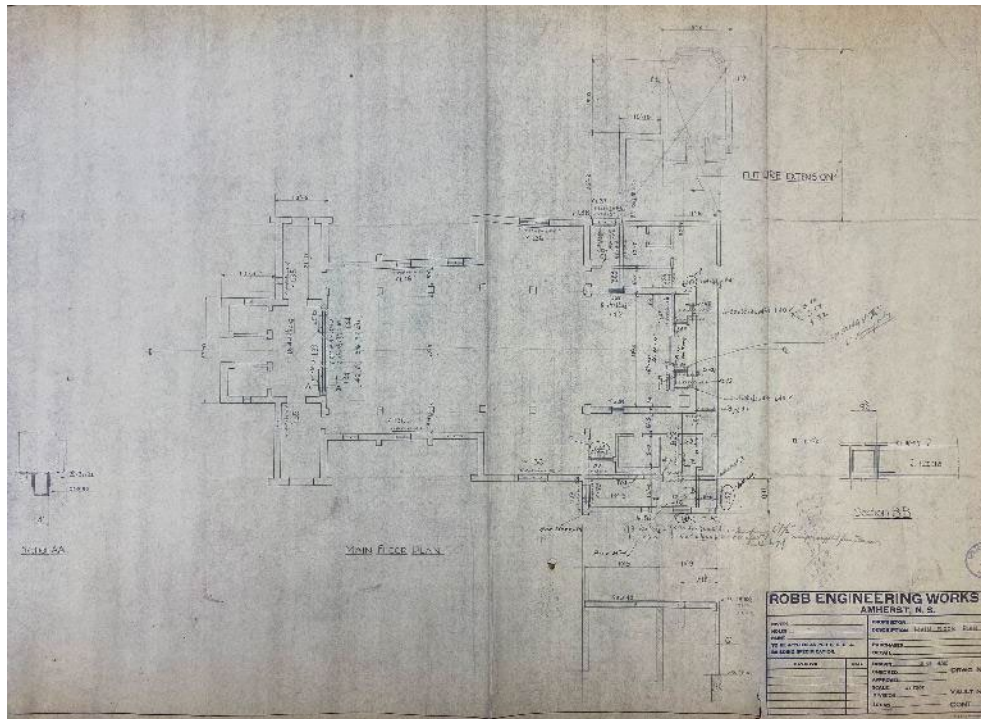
Main floor construction plan, showing the rear wing is removed from the construction plan, 1948<sup>16</sup>
